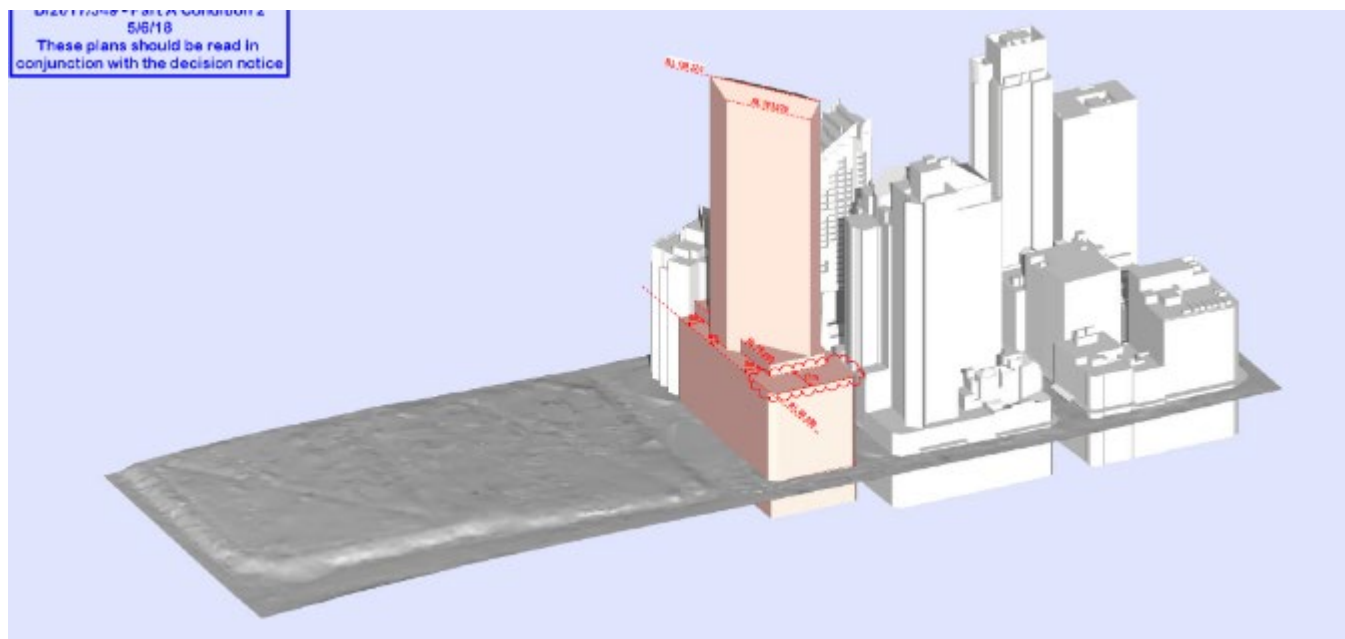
| Approved envelope east-west Park Street elevation for D/2017/349
